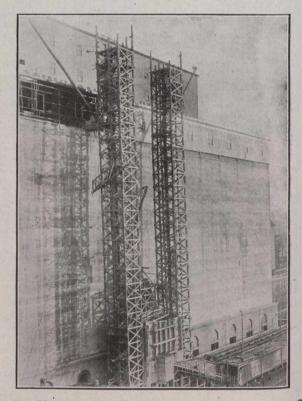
Nearing Completion—90 per cent. of Roof Concreted and 75 per cent. of Corrugated Sheeting in Place.
